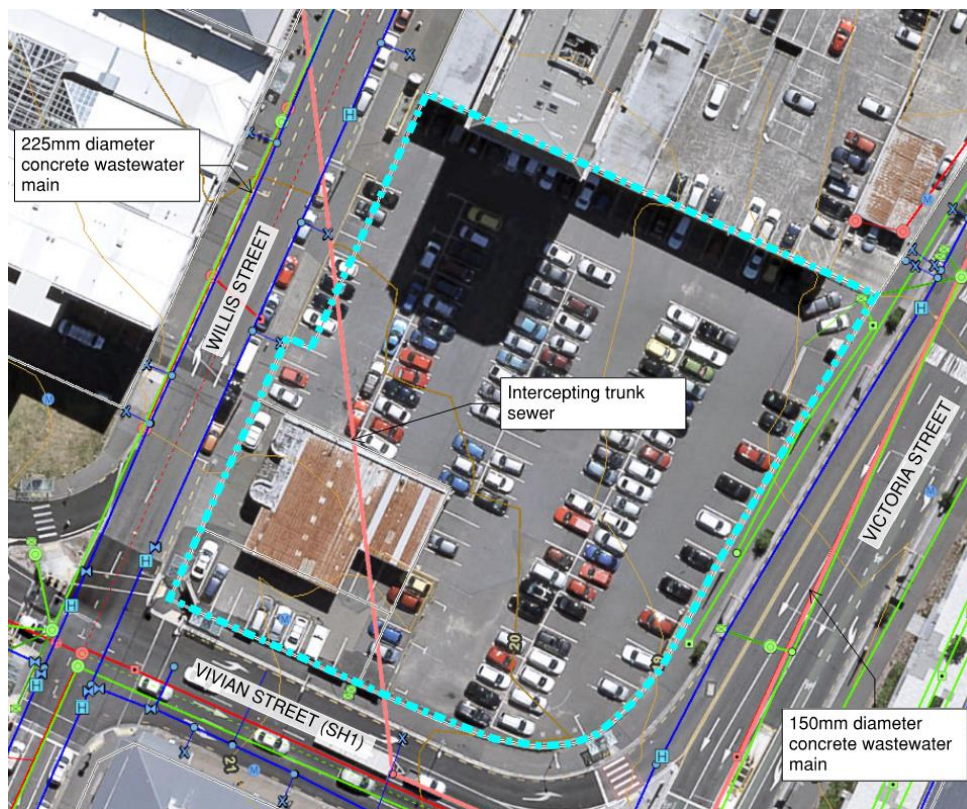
Wastewater Drainage Overview (Source: WCC GIS)
